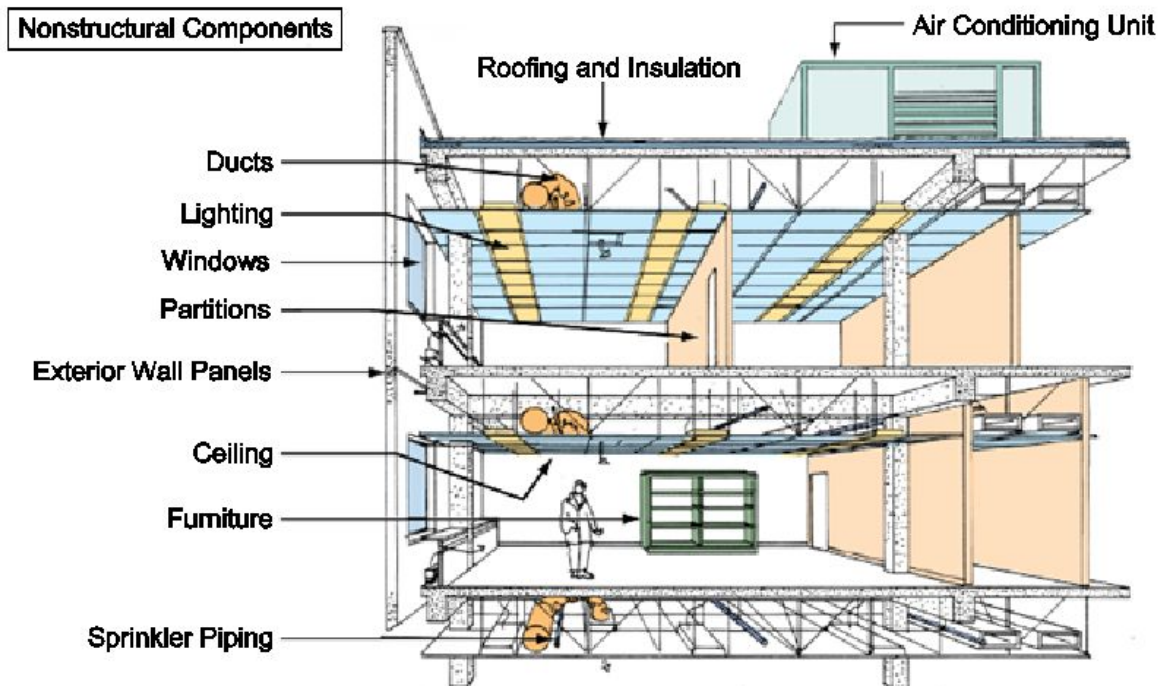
shows typical nonstructural components present in most hospital facilities. The building envelope includes the systems that separate the interior spaces from the exterior, both structural and nonstructural. It includes exterior walls and cladding, roof systems, doors and windows, and floors or slabs that separate the building interior from the ground. Contents and equipment are completely dependent on the type of occupancy and the function of the space, and range from items such as furniture encountered in a lobby or a waiting room, to highly technical equipment commonly present in treatment rooms. In addition, laboratories, pharmacies, bulk storage areas, and large central energy plants have highly specialised and frequently very sensitive equipment. In general, both the building service systems and the contents of hospitals rank among the most complex and expensive of any building type. Furthermore, both the structural system and most of the nonstructural systems are required to perform without interruption after an earthquake to enable adequate functionality.
